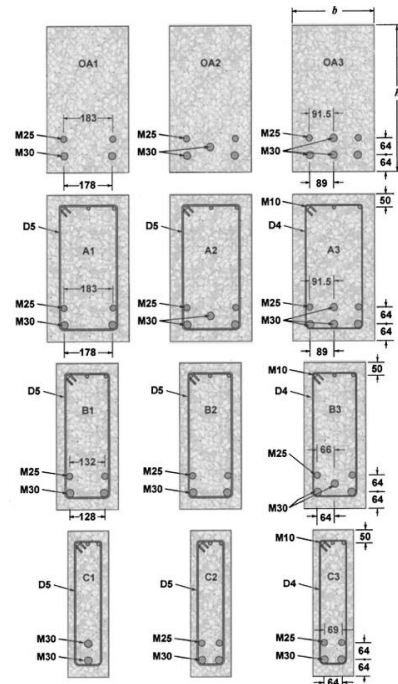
Cross-sections and reinforcement of the individual beams (Vecchio and Shim 2004)
